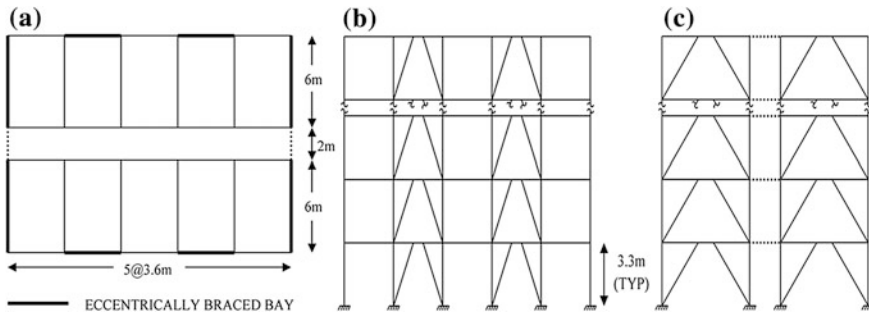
Geometry of buildings considered in the study: a plan, b elevation along longitudinal direction, and c elevation along transverse direction
